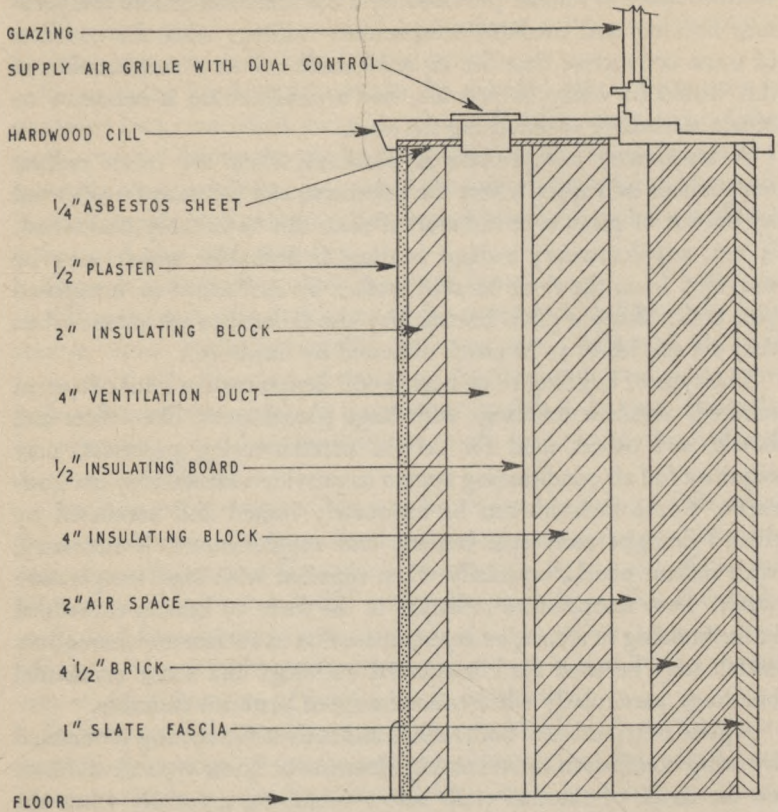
A METHOD OF HEATING AND COOLING AN OFFICE BUILDING. An inconspicuous arrangement for supplying conditioned air discharged through grilles in the window sill
